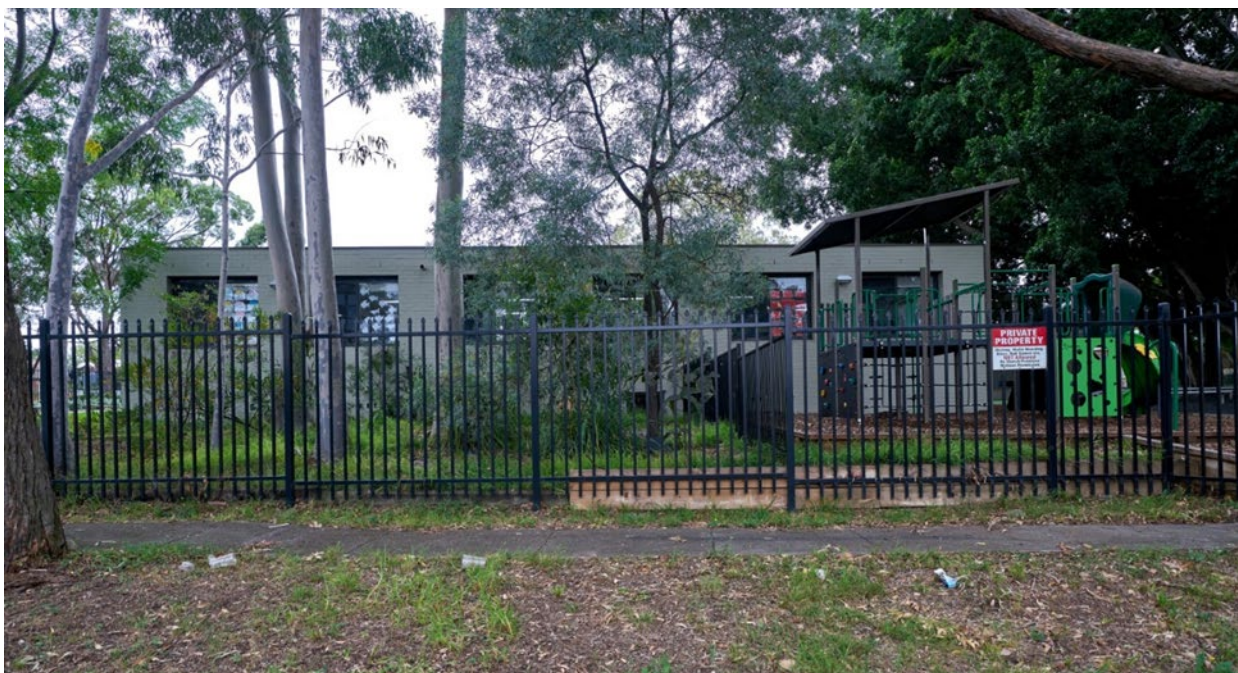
The existing classroom building to be demolished. (Ross Thornton, 2024)
